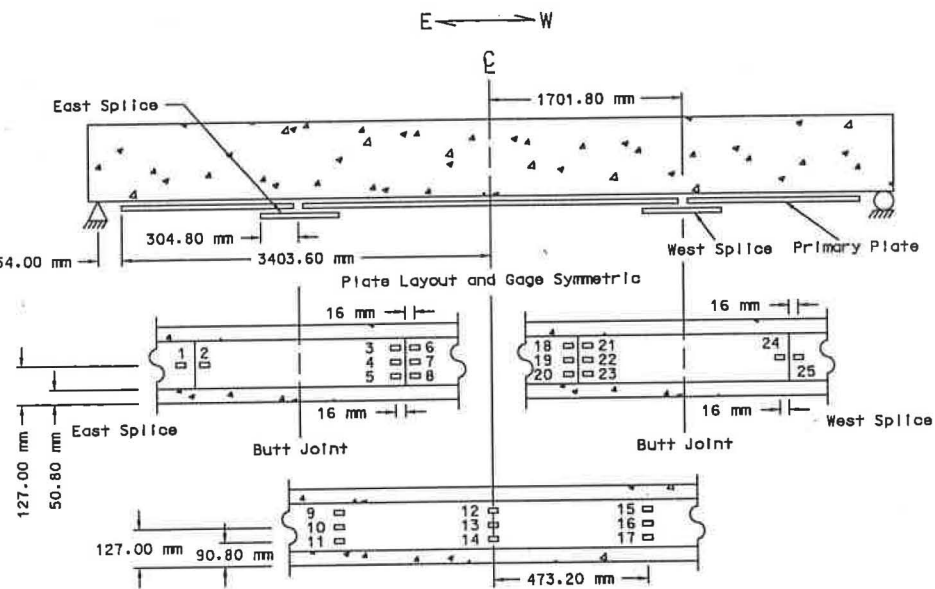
CFRP Plate Layout and Gage Locations, Beam 4 (ULT 2)
